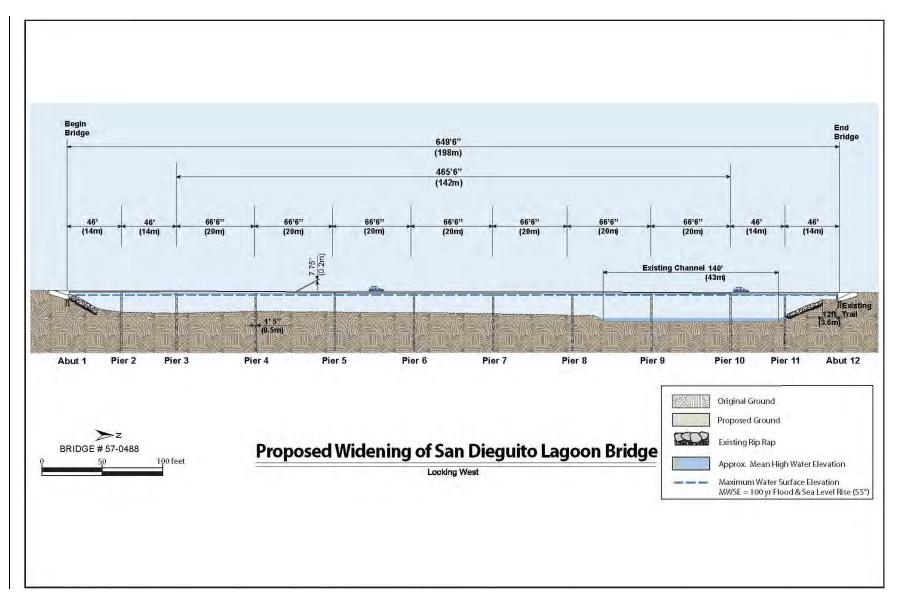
San Dieguito Lagoon: Cross-sections for the Existing I-5 Bridge and Proposed 8+4 Buffer
